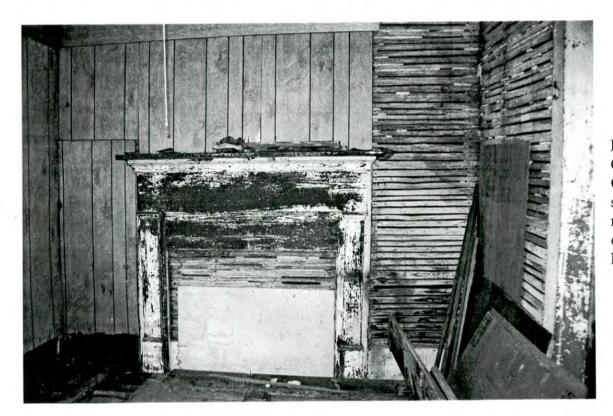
Calvin C. Gore House south wall of rear bedroom, doorway to hall at far right
